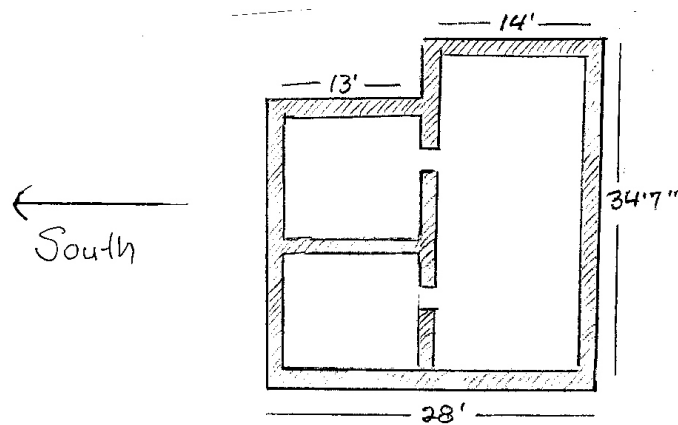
Original floor plan as of June 14, 1976.* No insulation was used and no cooling mechanisms or overhangs existed. There was one window on the north side. Late in the day a large tree partially shaded the northwest corner of the house. The building was kept closed during the period the data was gathered.
